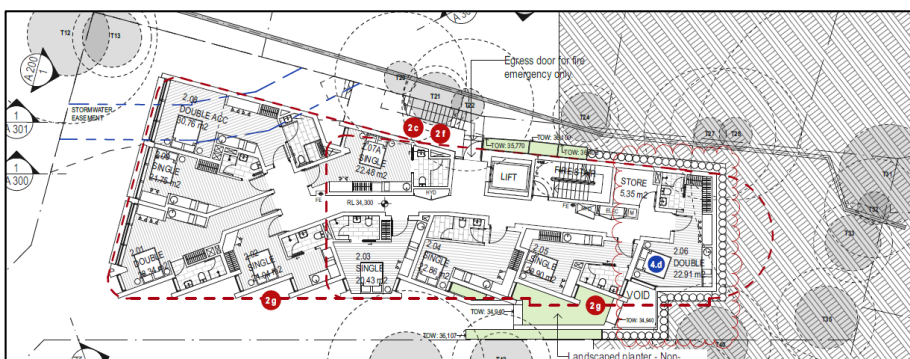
Proposed second floor plan (Source: TonkinZulaikhaGreer)
